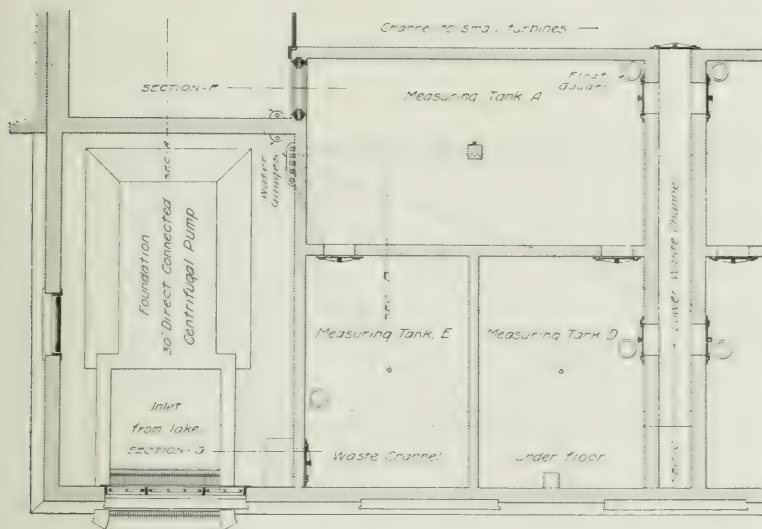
Part of Basement Plan of Hydraulic Laboratory showing Measuring Basins.
